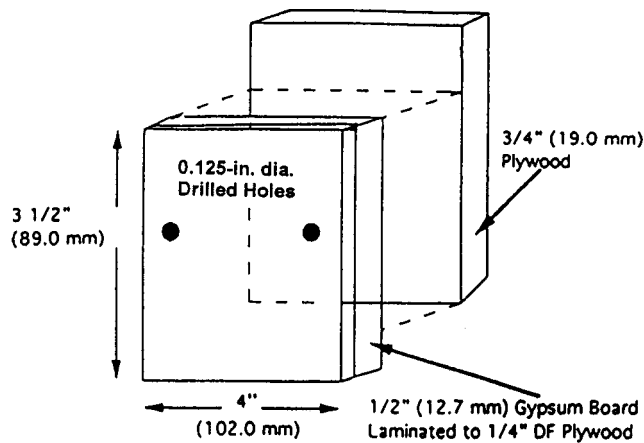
Predrilled Shear Test Specimen Prior to Assembly
